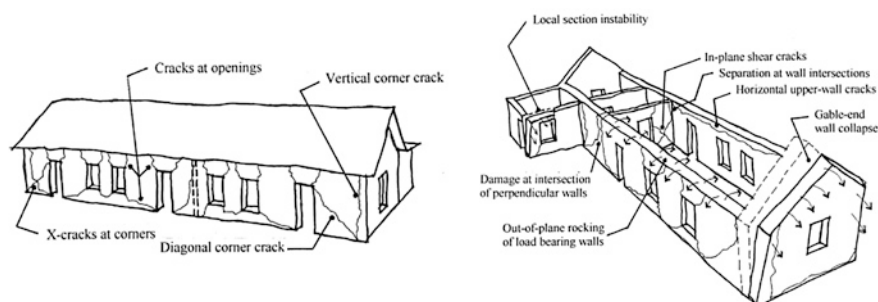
Typical damages observed in adobe buildings after the Northridge earthquake [19]
